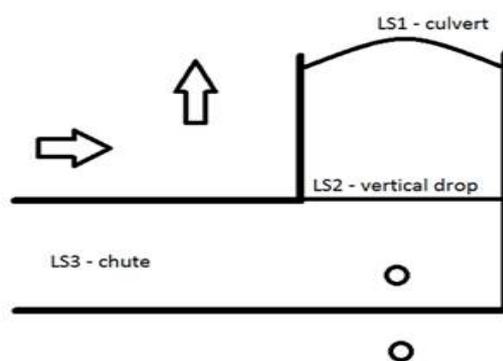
Site plan for Mill Stream Barrier 2
